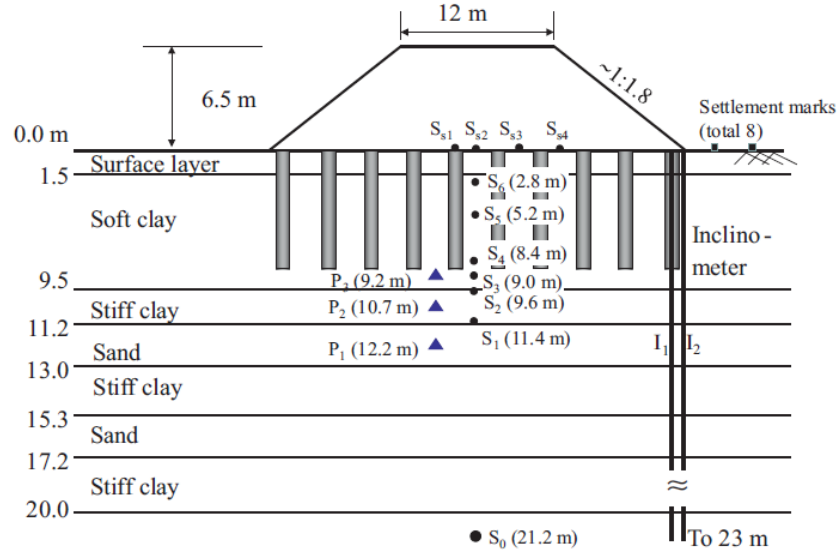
Instrumentation plan showing the embankment geometry, piles configuration, subsoil profile, and key instrumentation points (Chai et al., 2015).
